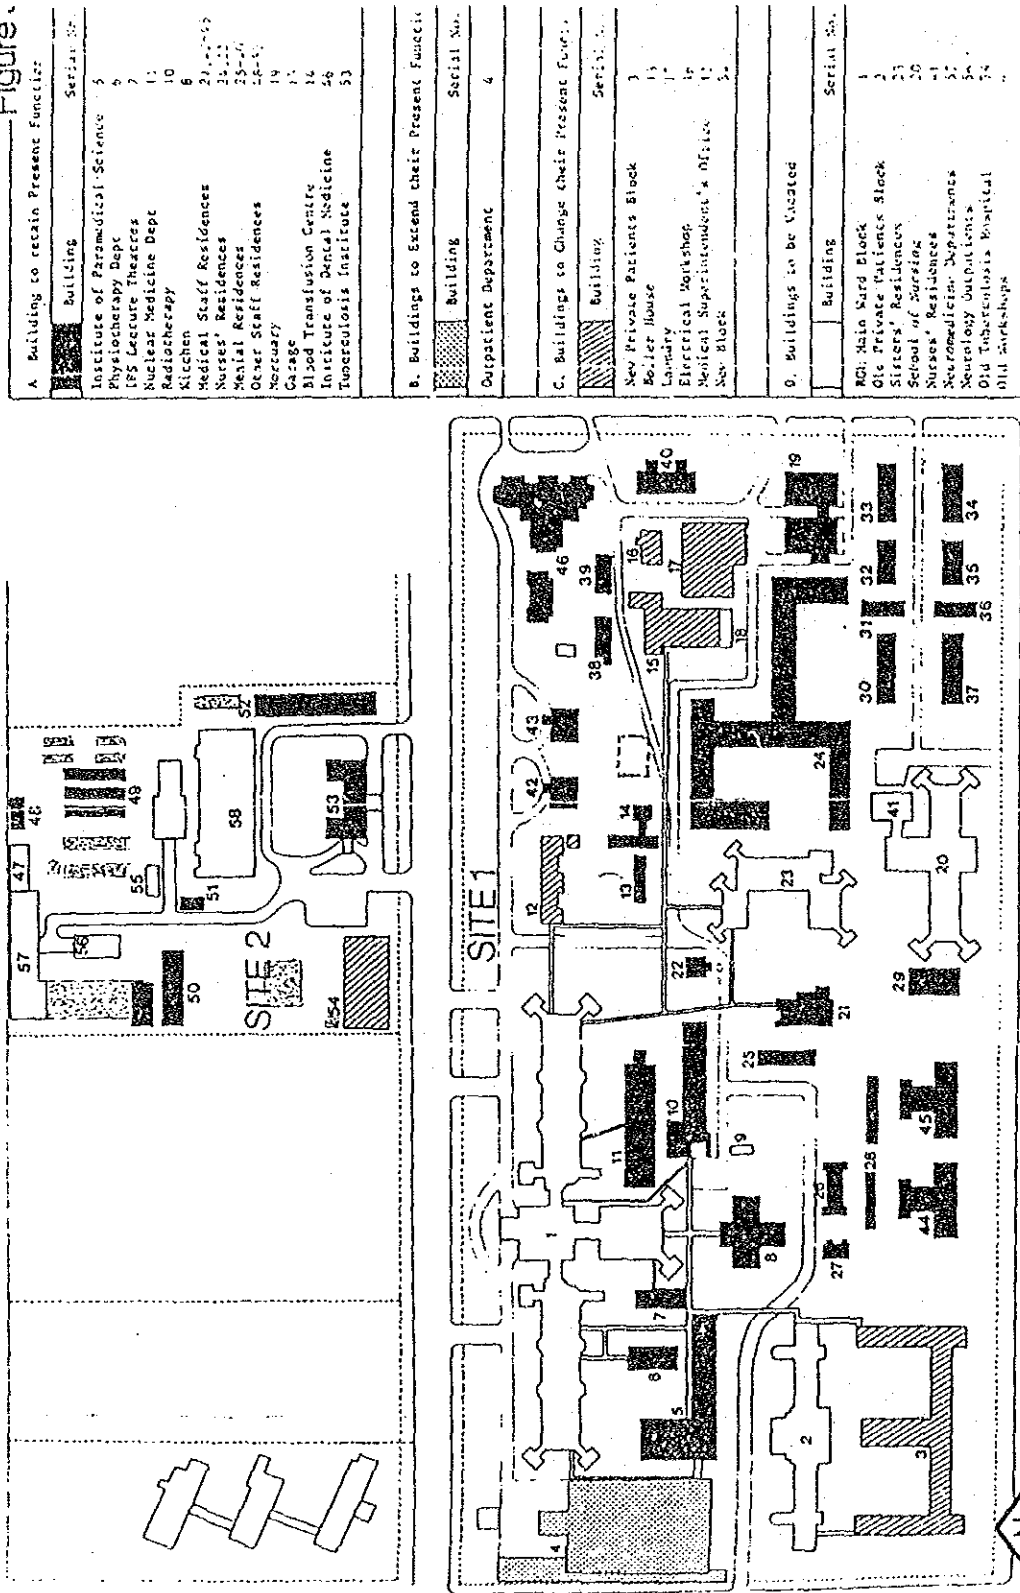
THE EXISTING BUILDING OF SITE
